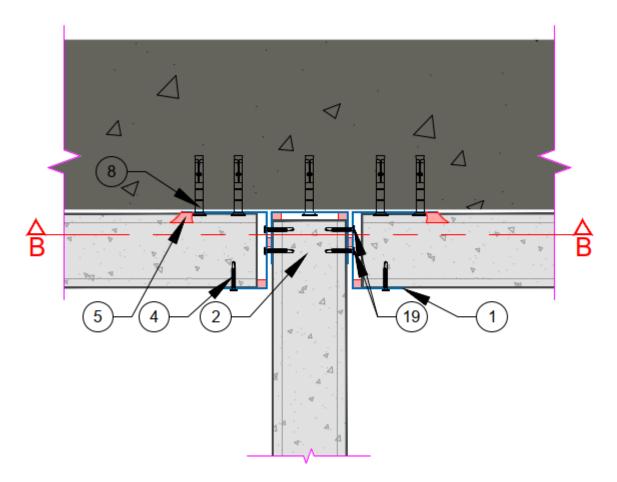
Dual void box riser – mid-wall connection when span is 6 m (connection to stringer)
